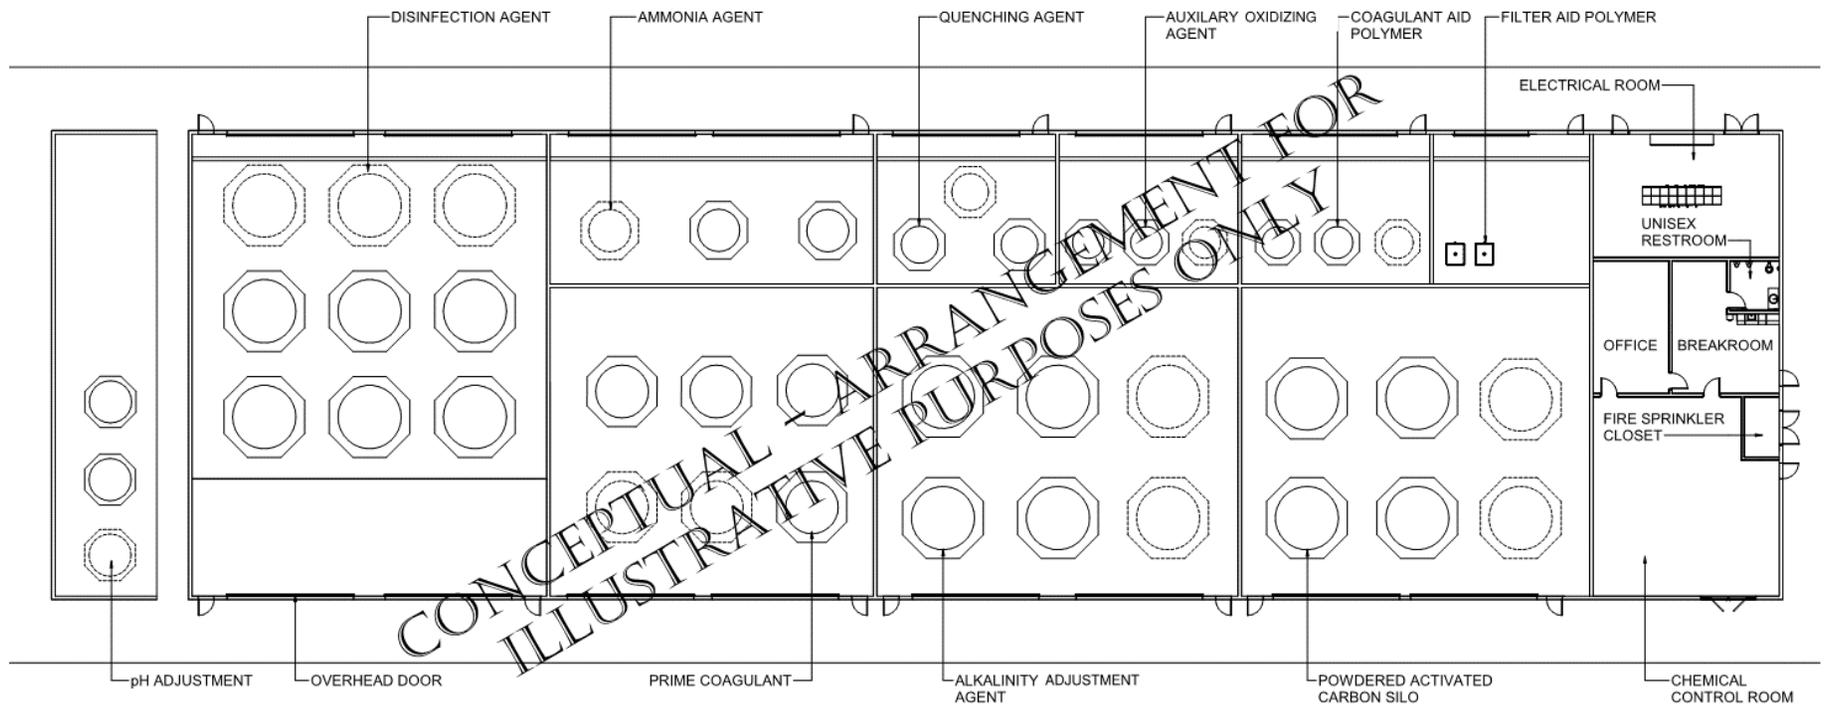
Potential concept for Chemical Feed Building floor plan
